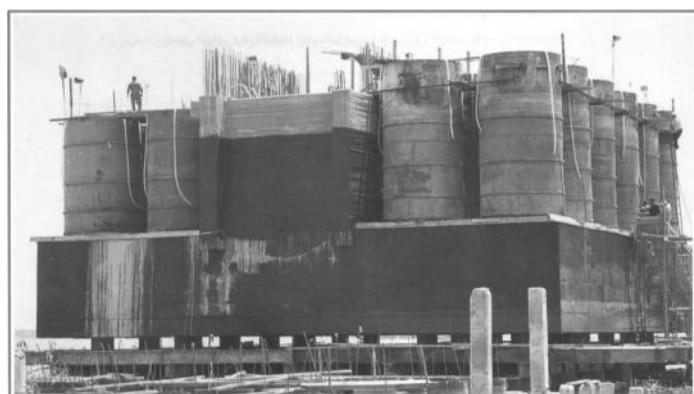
After pouring the bottom, sides, and forming the working rooms (El-Moneeb Bridge).
